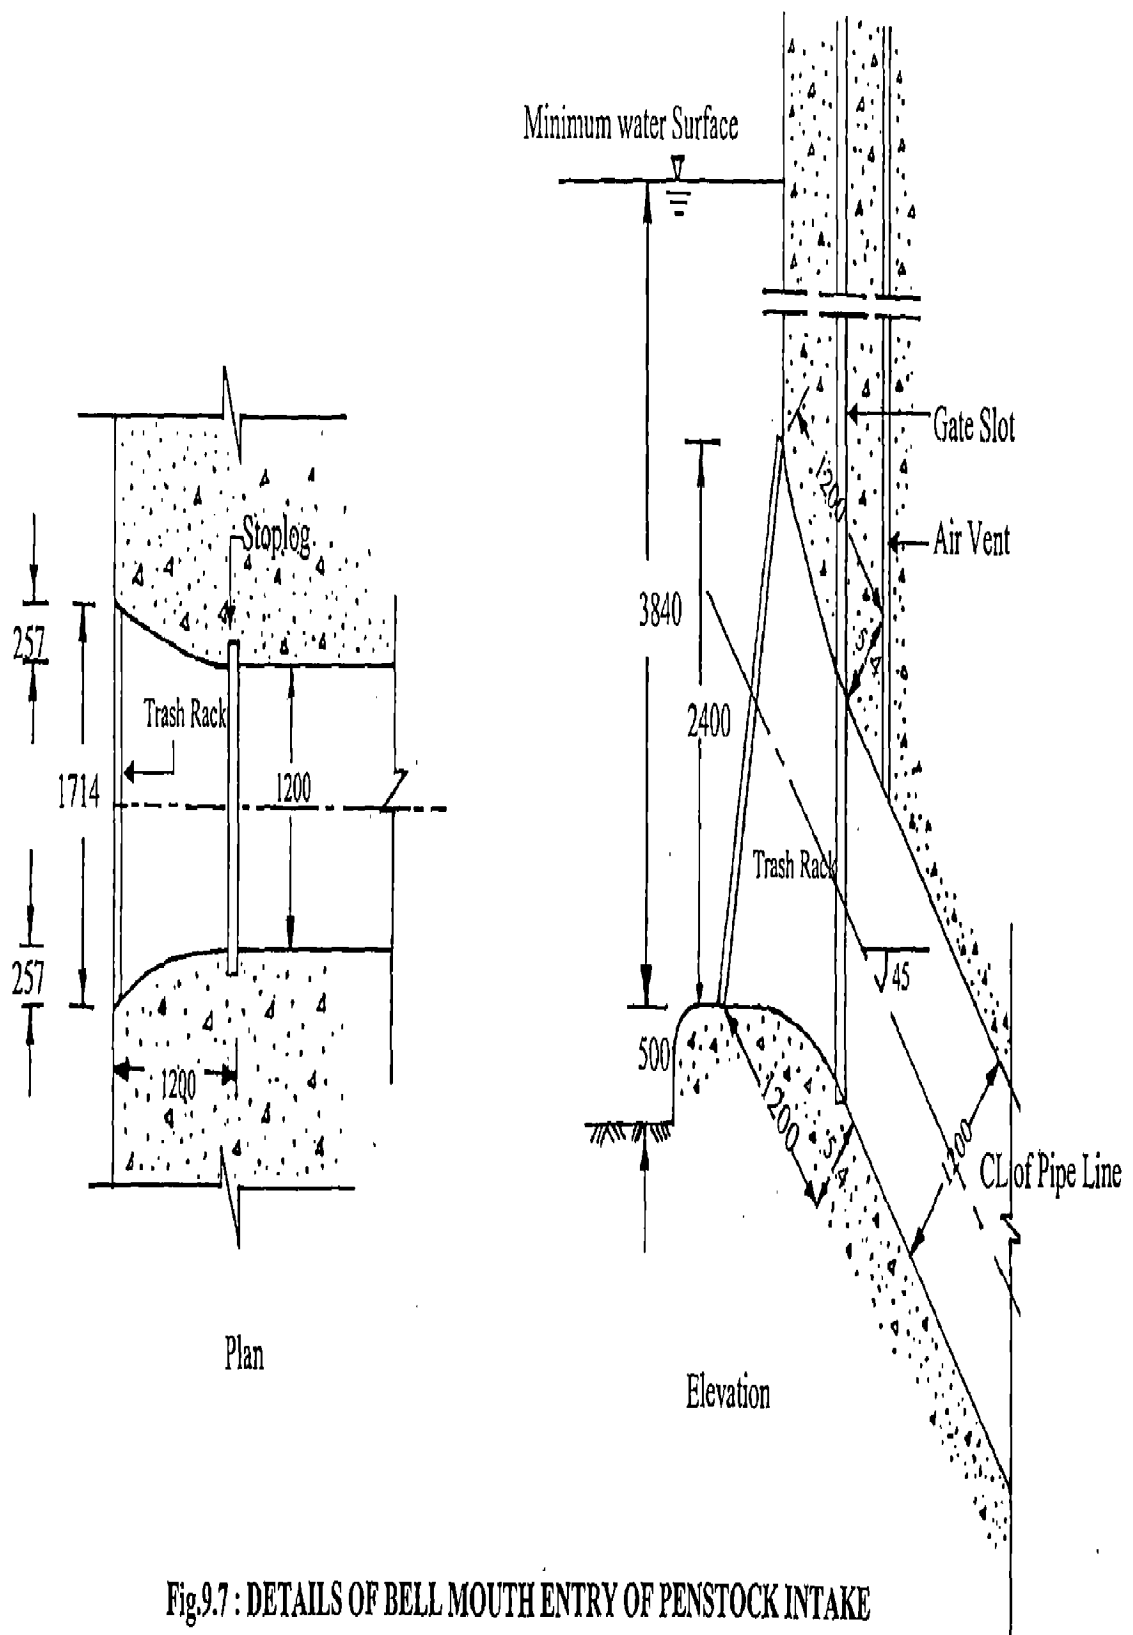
DETAILS OF BELL MOUTH ENTRY OF PENSTOCK INTAKE
